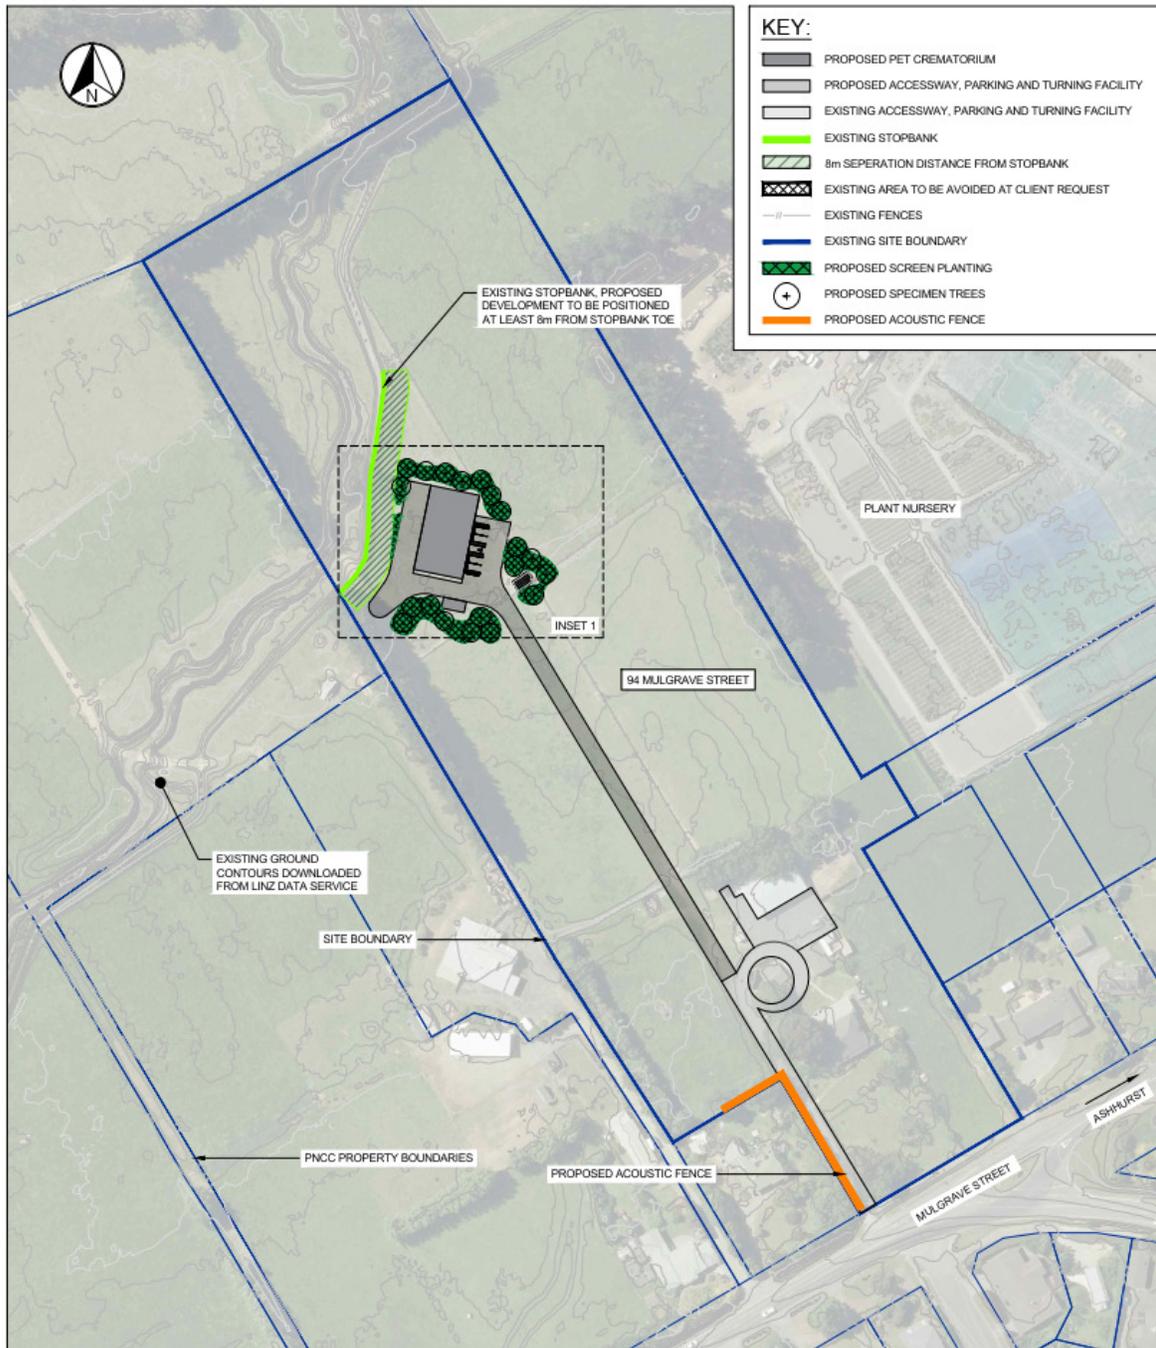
Proposed location of new Crematorium buildings onsite.
